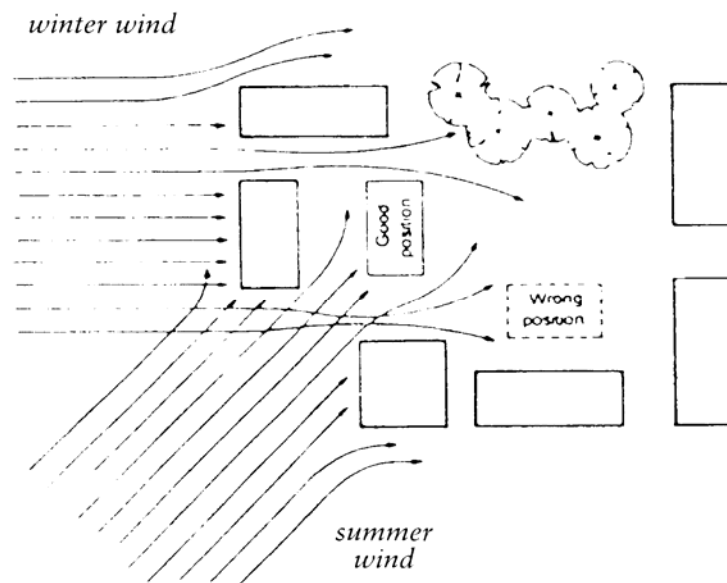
Examples of good and bad locations of a building on an urban site with respect to wind. /Allard/.
